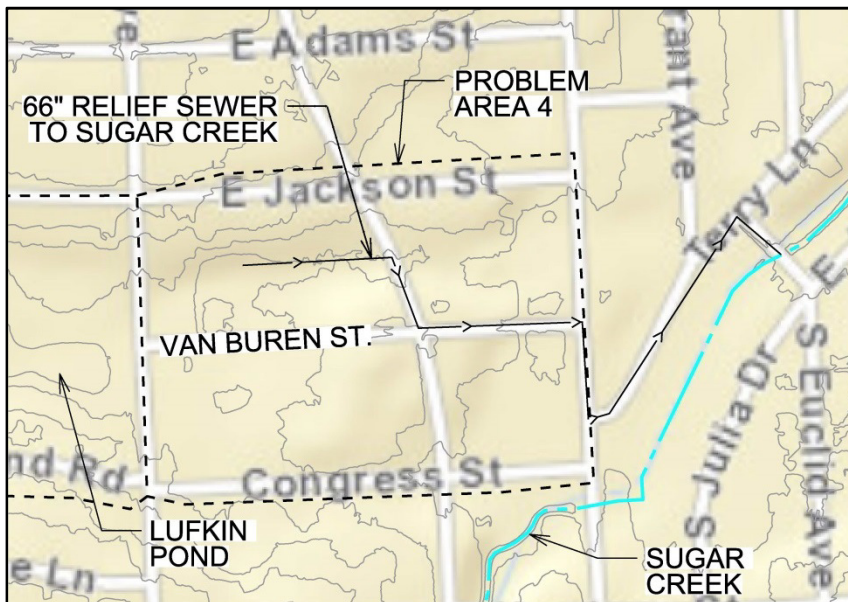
D – Proposed Improvements for Proposed Alternative 4a
